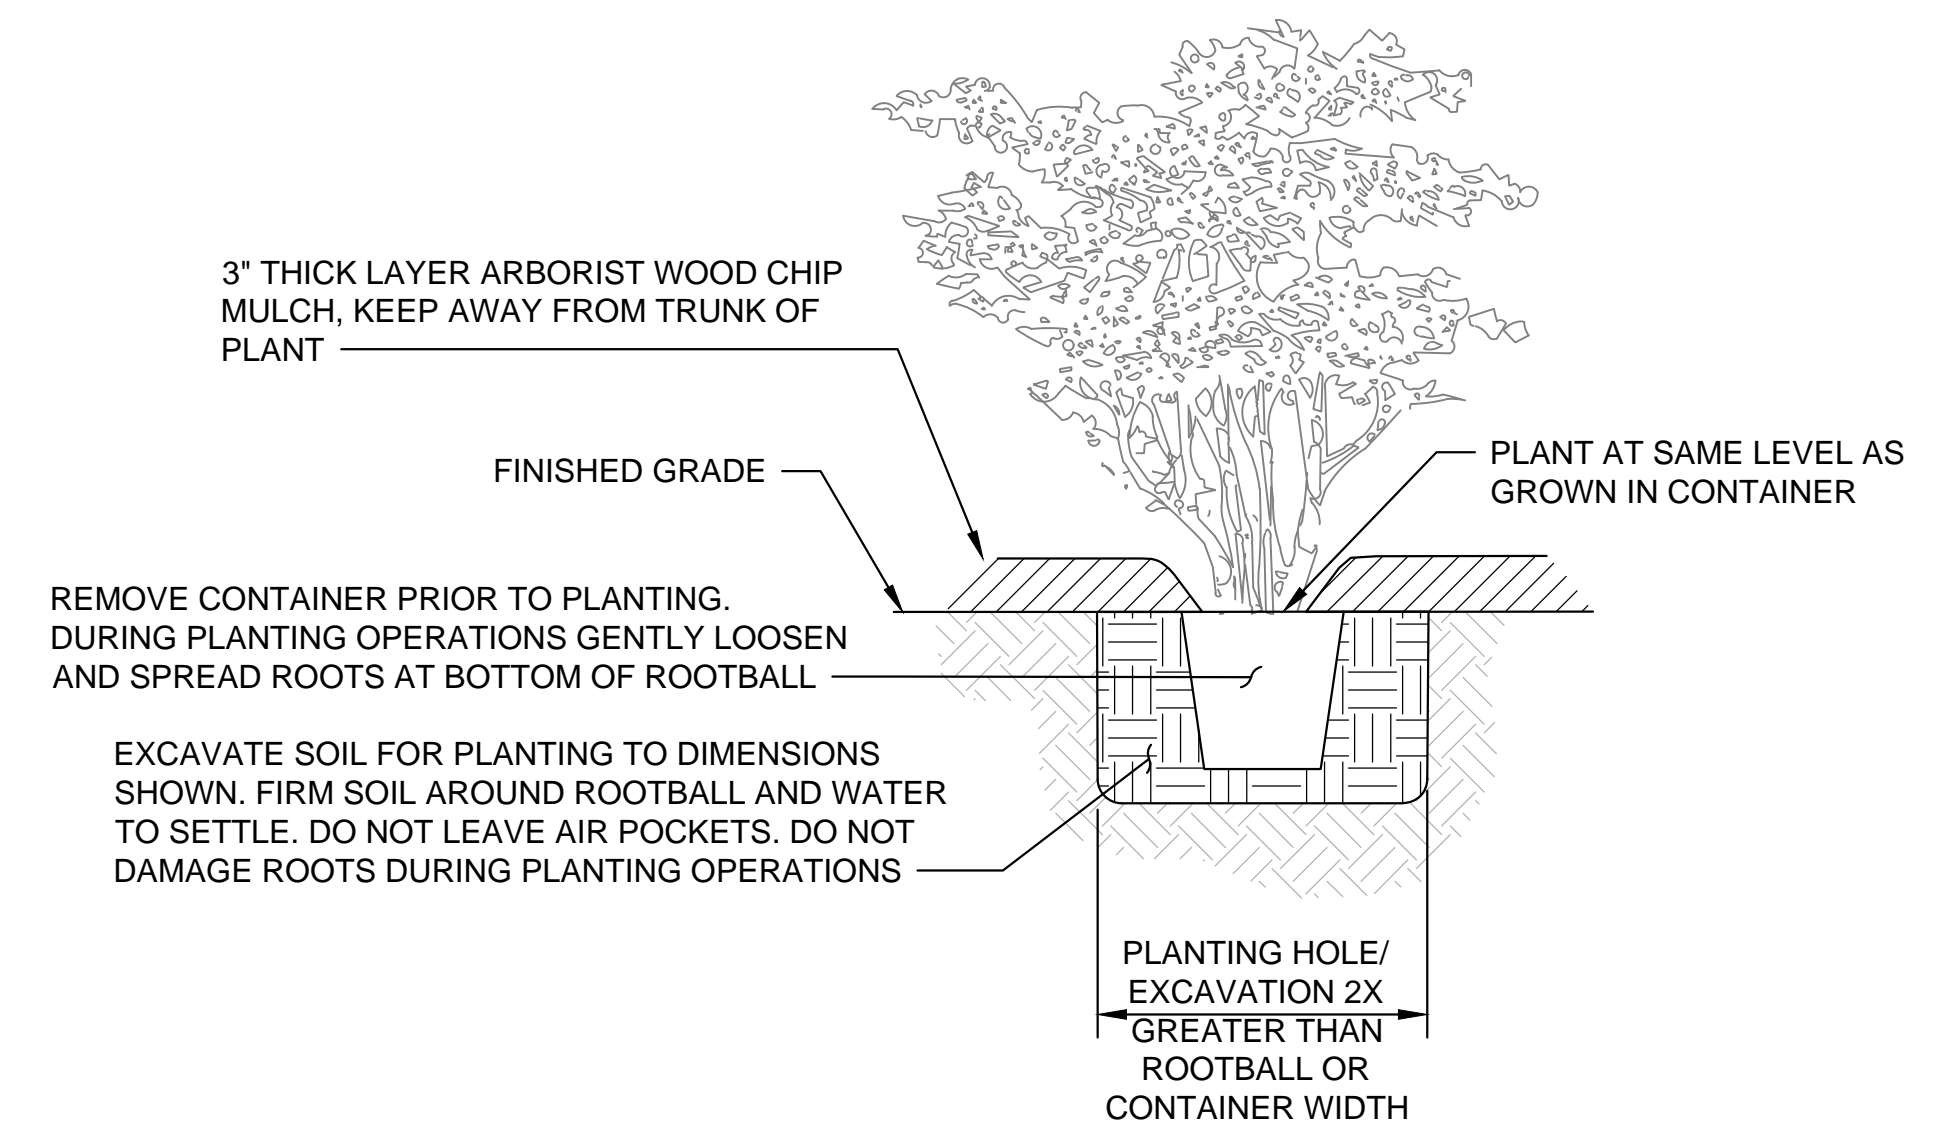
" DEEP ROOT PLUG PLANTING
